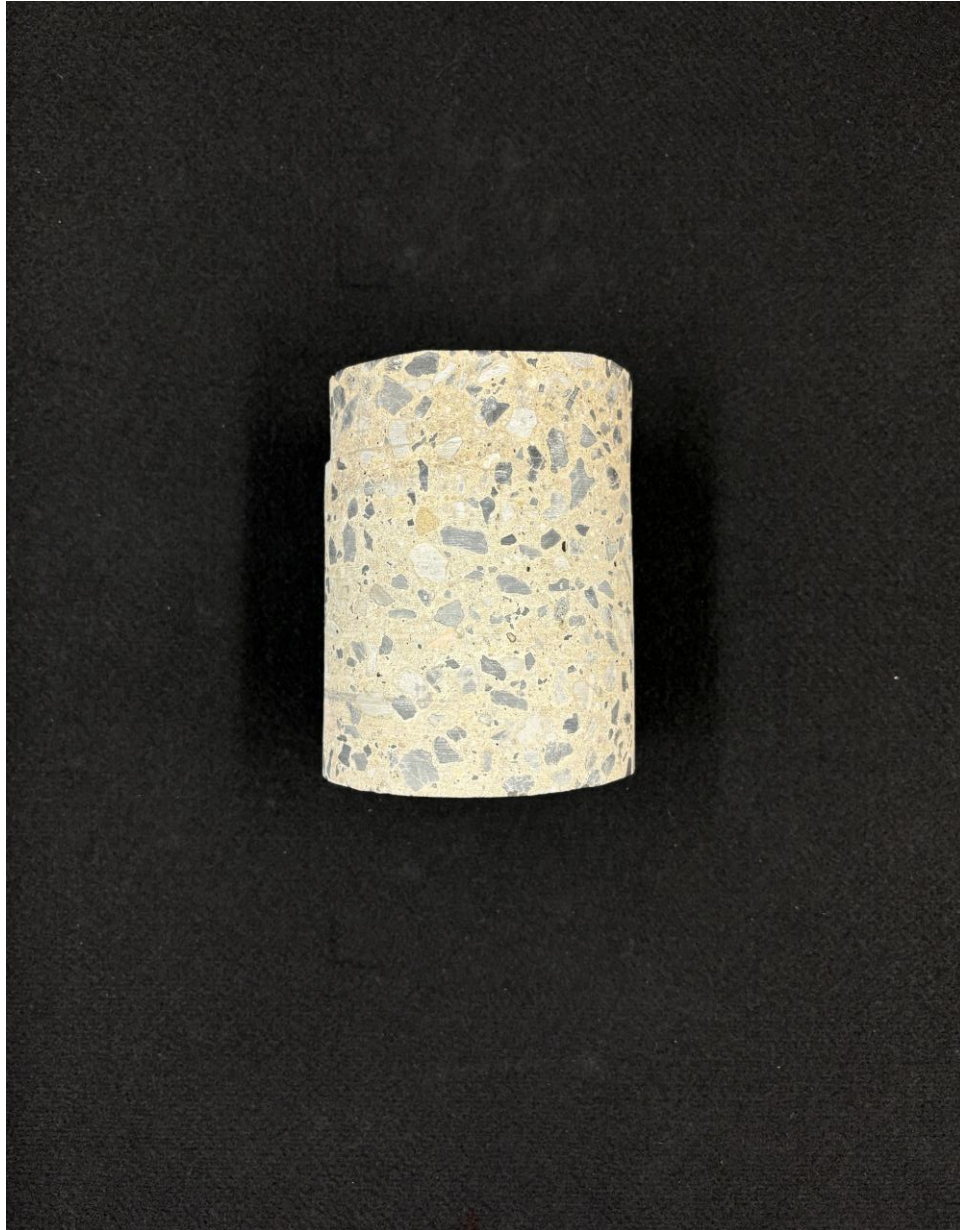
Core 1 of lightweight concrete deck at bridge C-1011.
